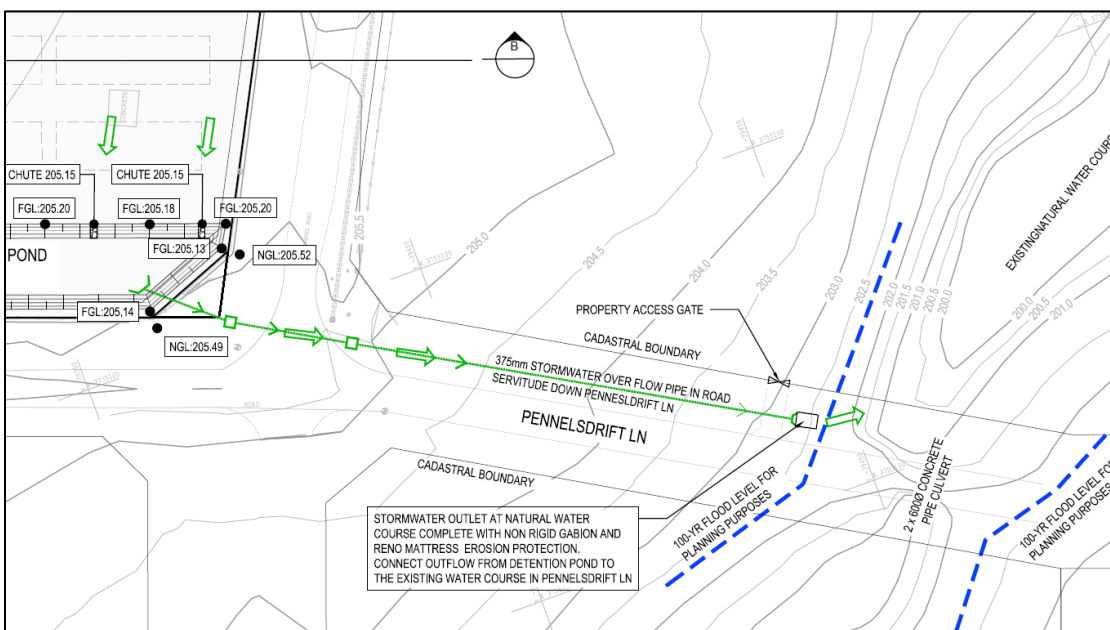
Stormwater management plan showing the proposed stormwater pipe extending from the site along the road reserve to the proposed stormwater outlet with reno mattress erosion protection.
